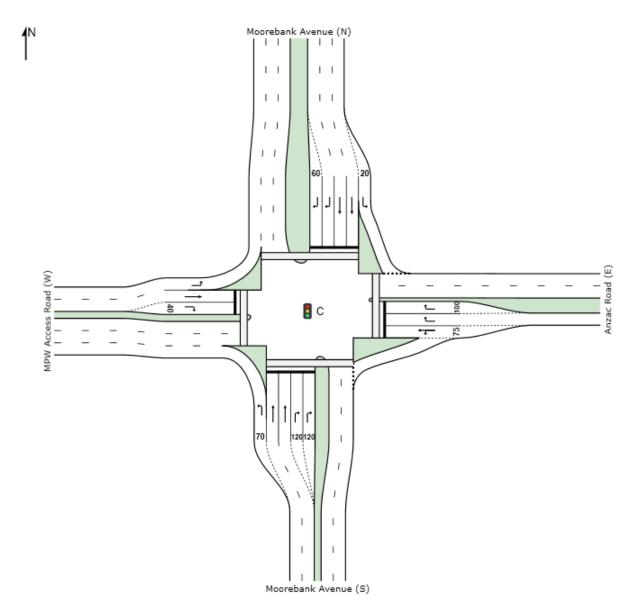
Upgraded Moorebank Avenue / Anzac Road intersection layout
